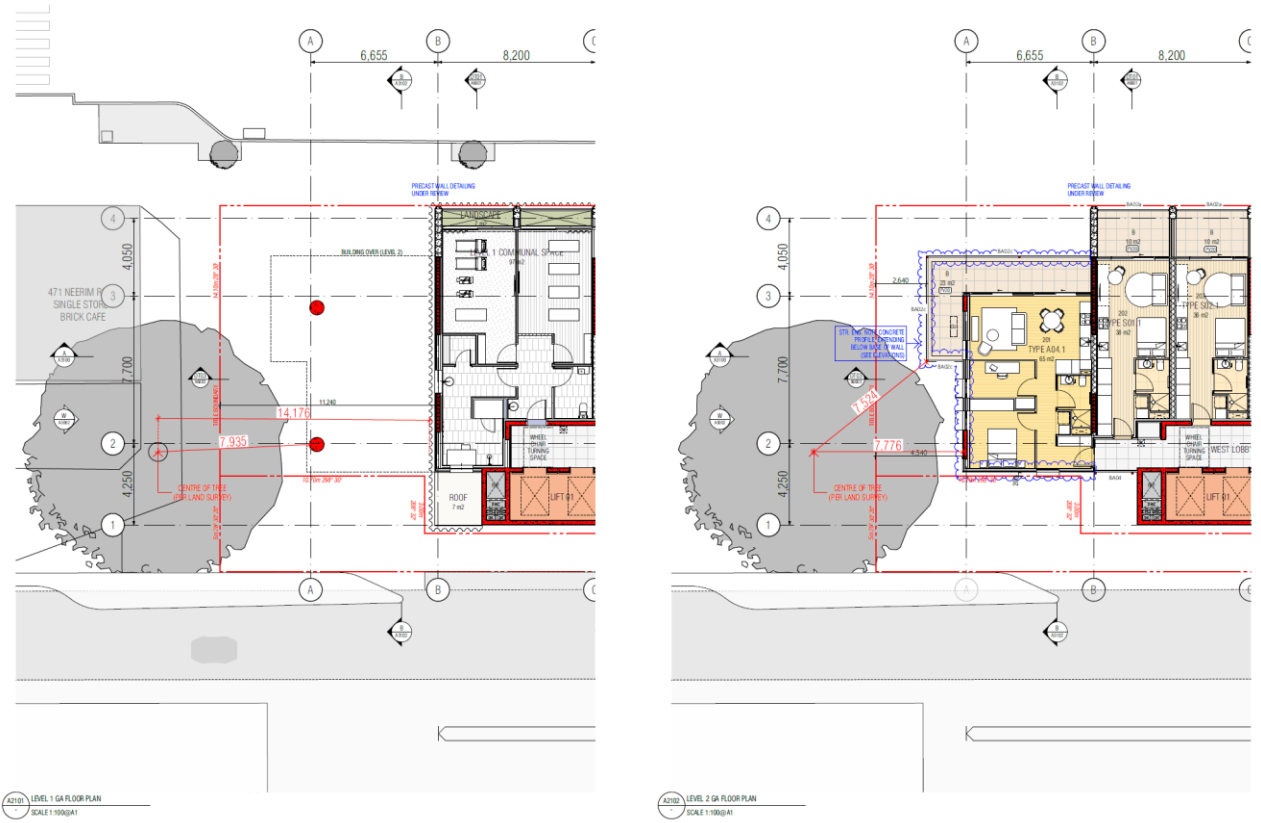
SKETCH SHOWING CLEARANCE OF TREE 1 TO BASEMENT PILES AND UPPER FLOOR
